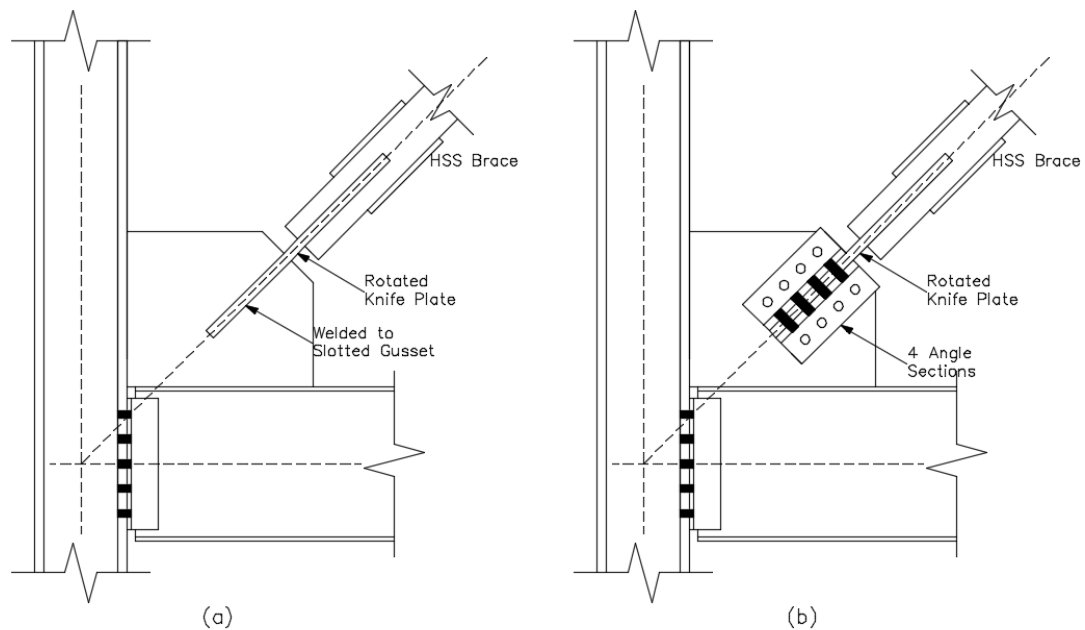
(a) Knife plate welded to gusset plate; (b) Knife plate bolted to gusset plate
